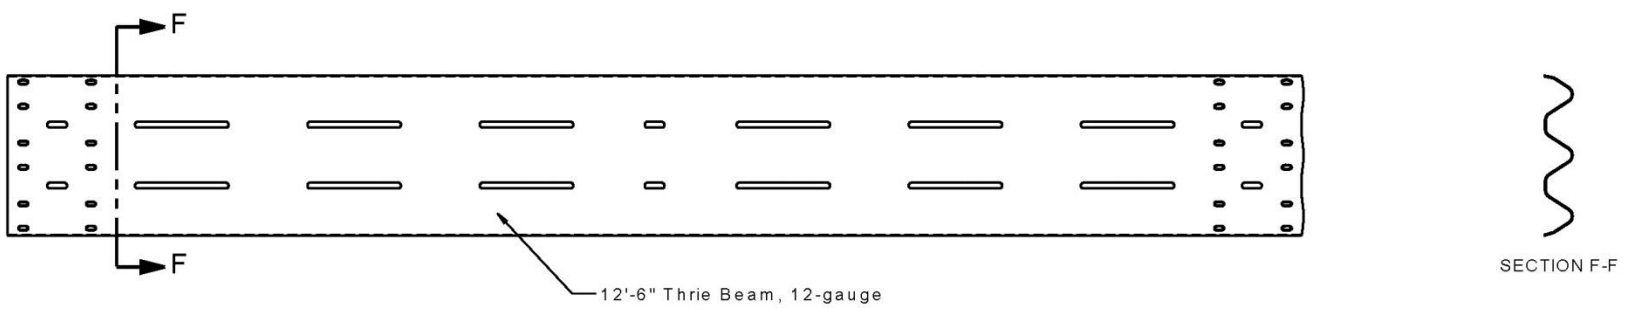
Thrie Beam Bend Details, MwRSF Short Radius Design [14]
